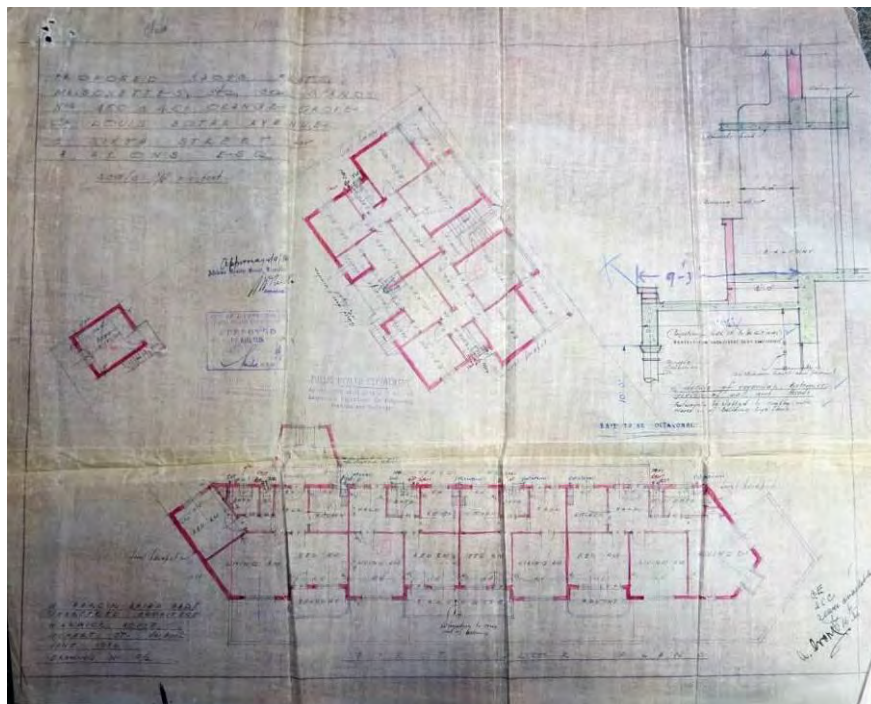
Floor plans for proposed shops, flats and maisonettes on Stand 450, Orange Grove from 1936
